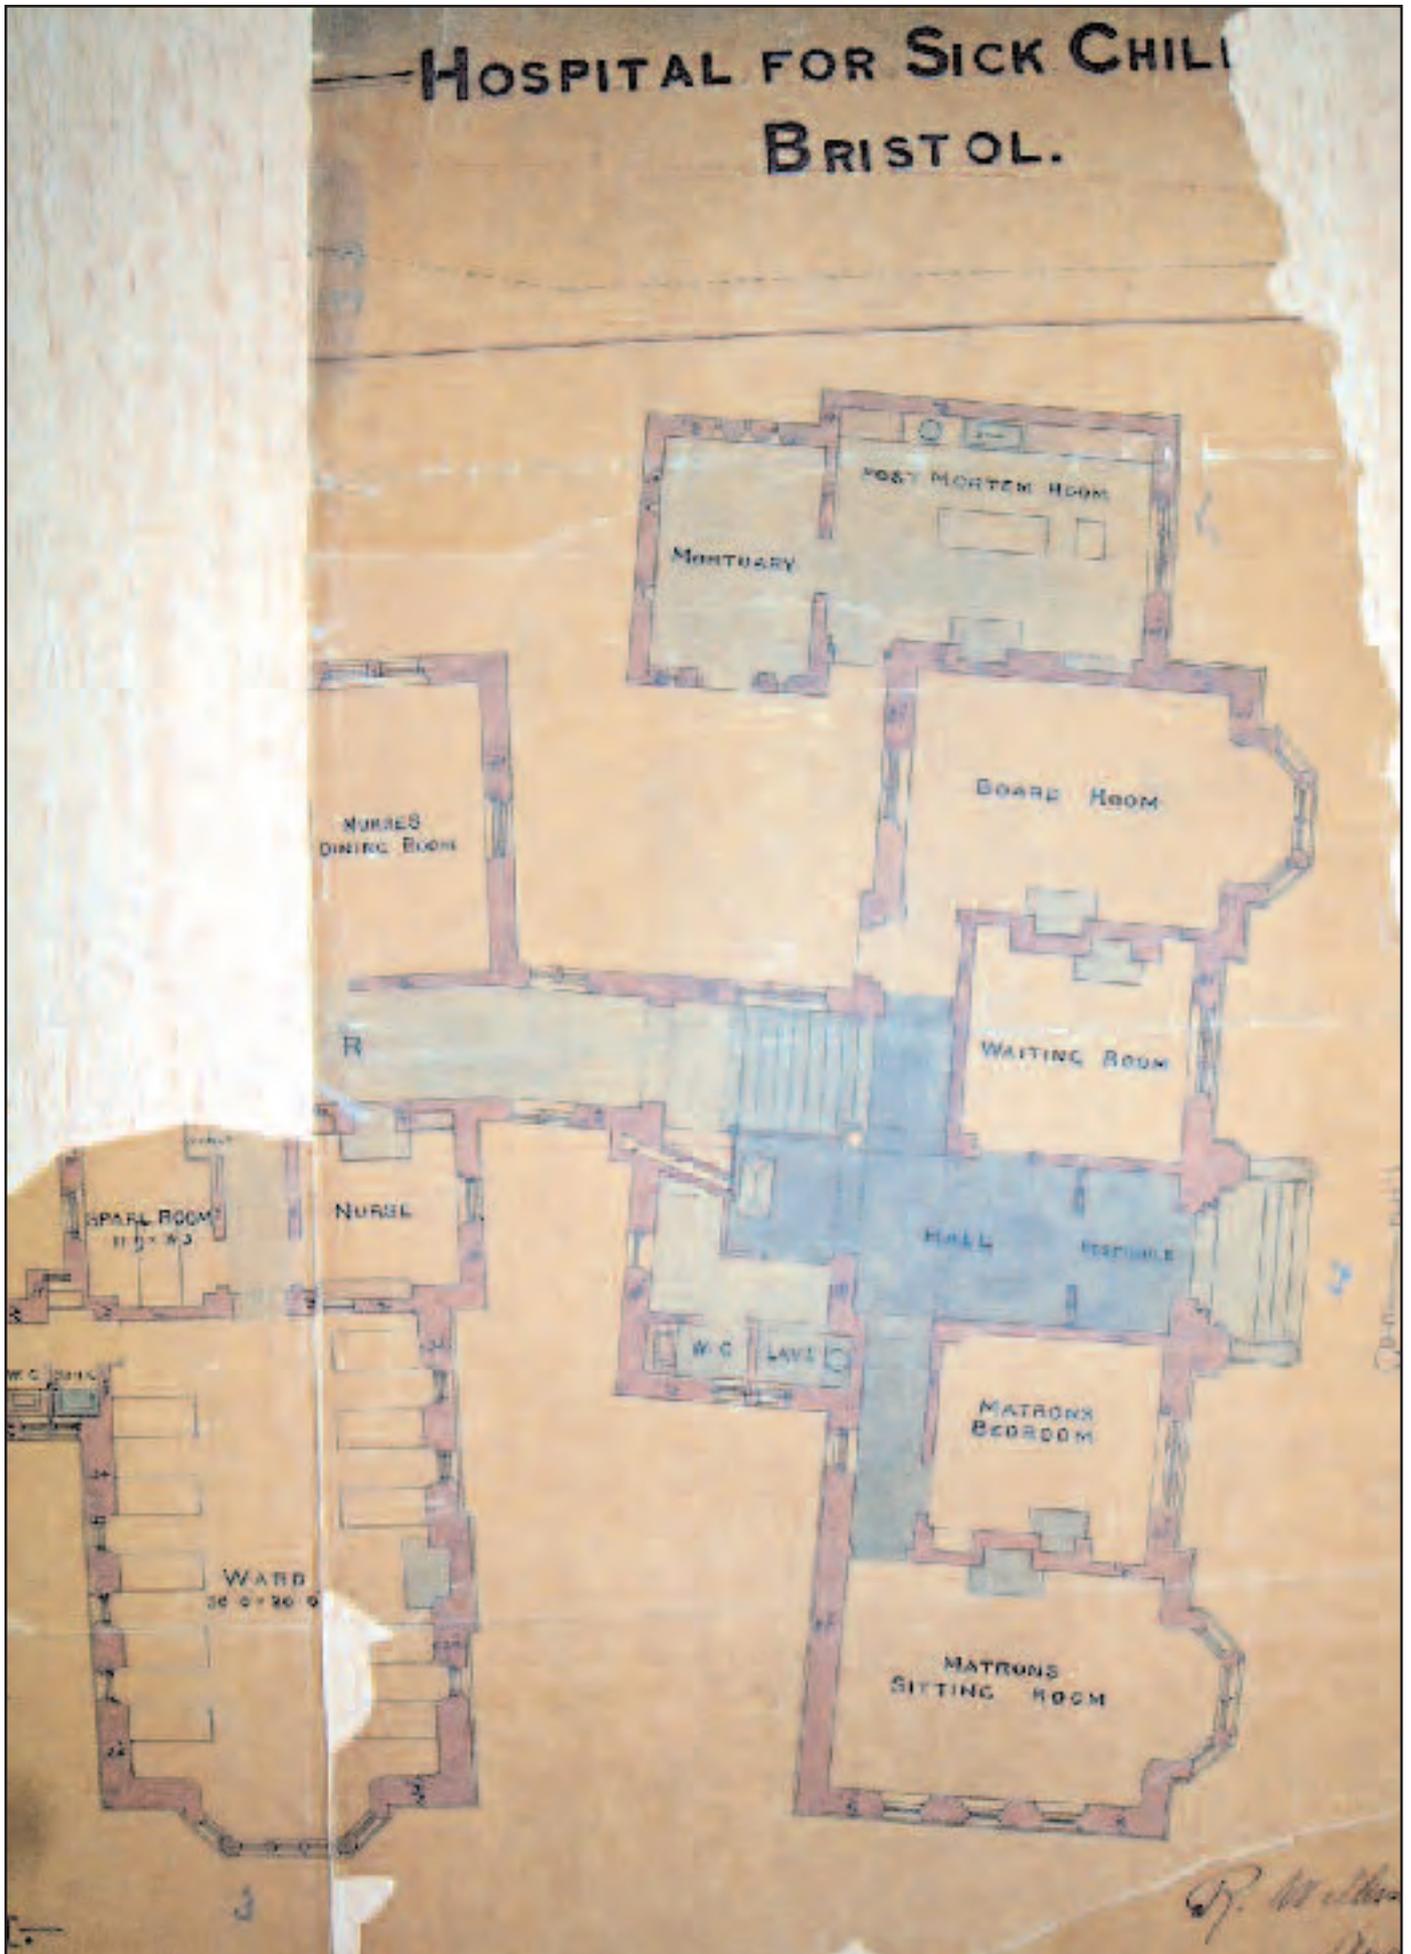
Children's Hospital, 1882 - ground floor of front building, etc.
